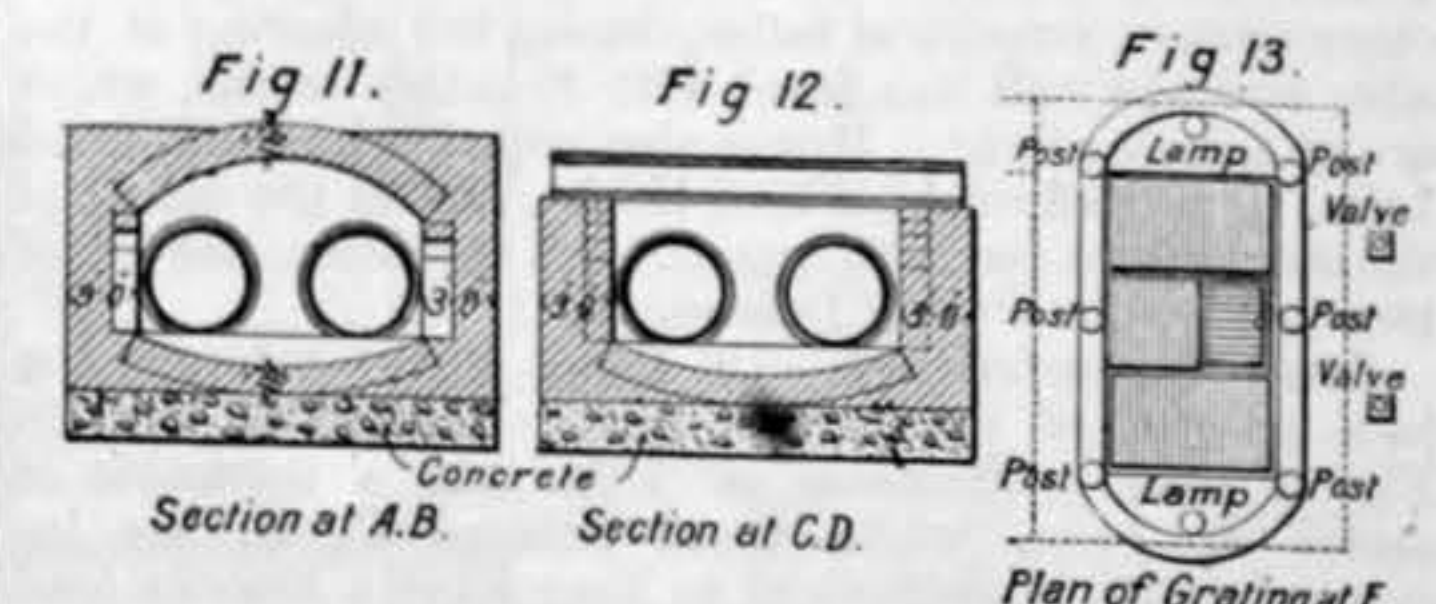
, Fig. 12, Fig. 13: Section at A.B., Section at C.D., Plan of Grating at E.
